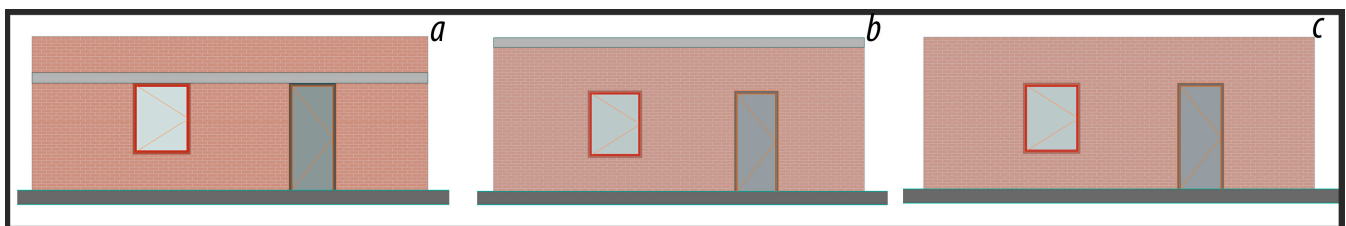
Lack of horizontal bond beam: (a) Above the window, (b) Above the wall, (c) No bond beam.
